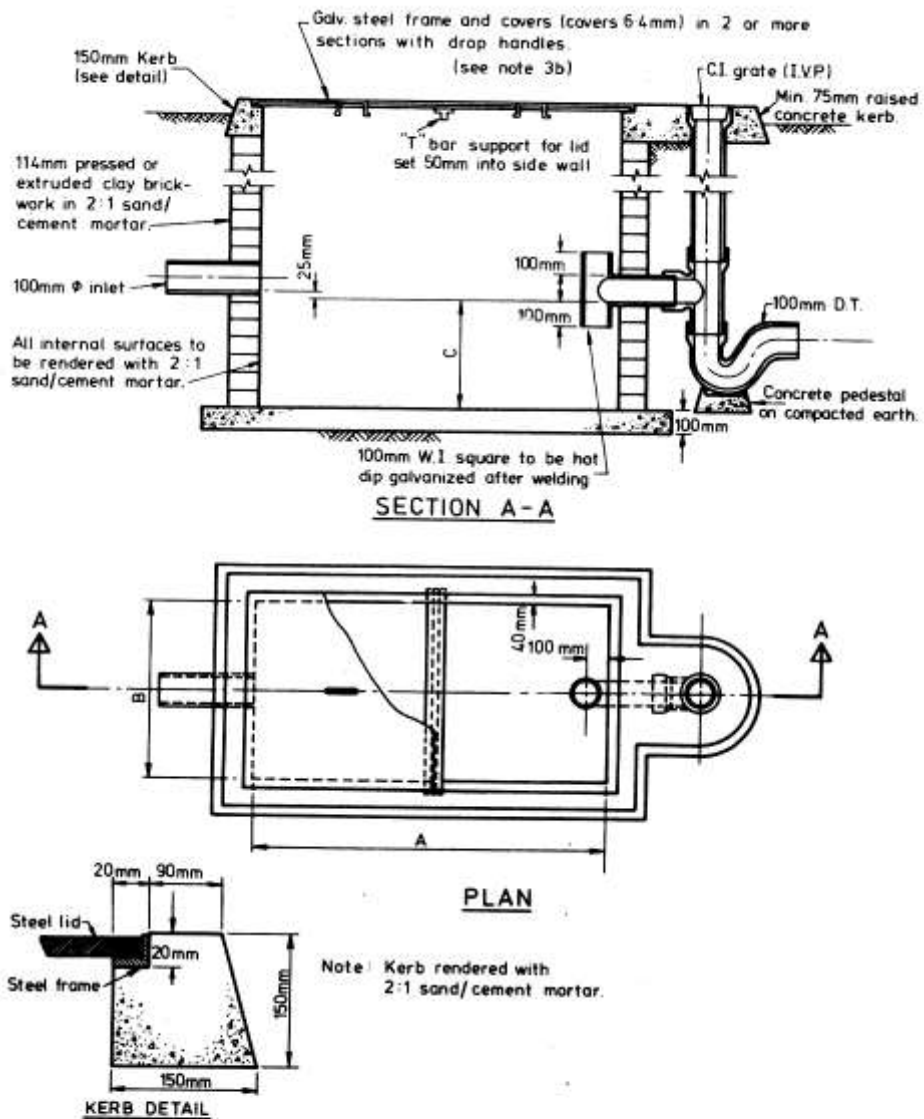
SAND/PLASTER TRAP CONSTRUCTION
